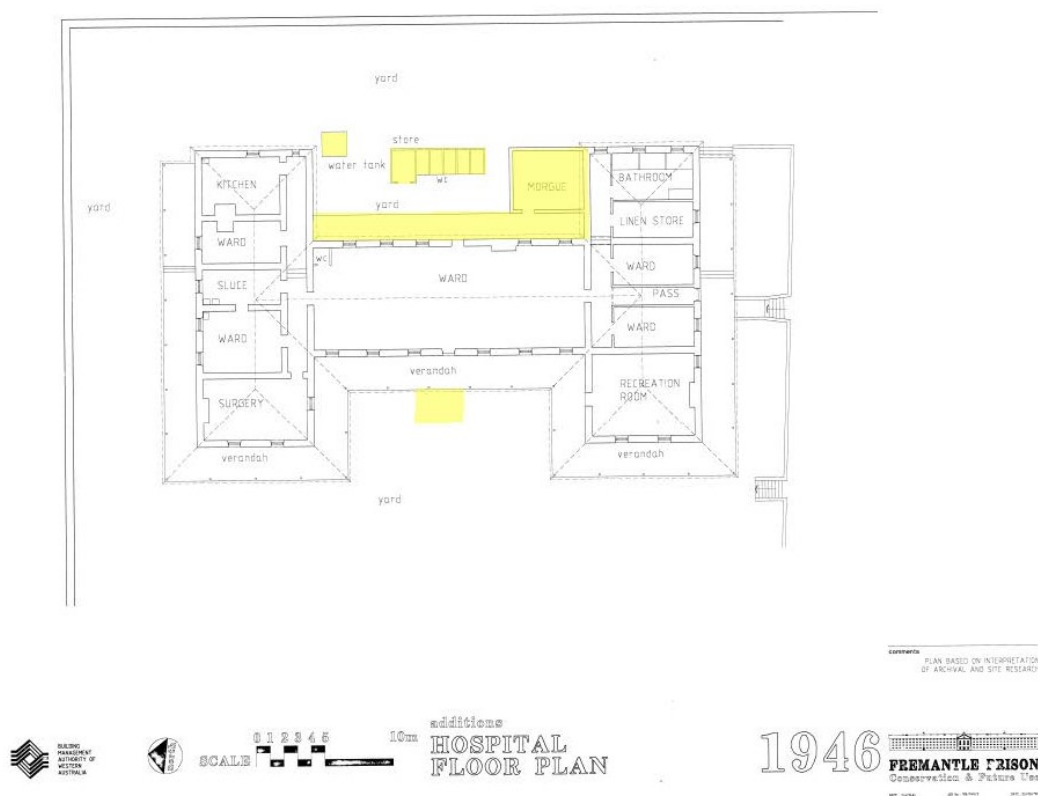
1946 Hospital Floor Plan, Building Management Authority, 1990
